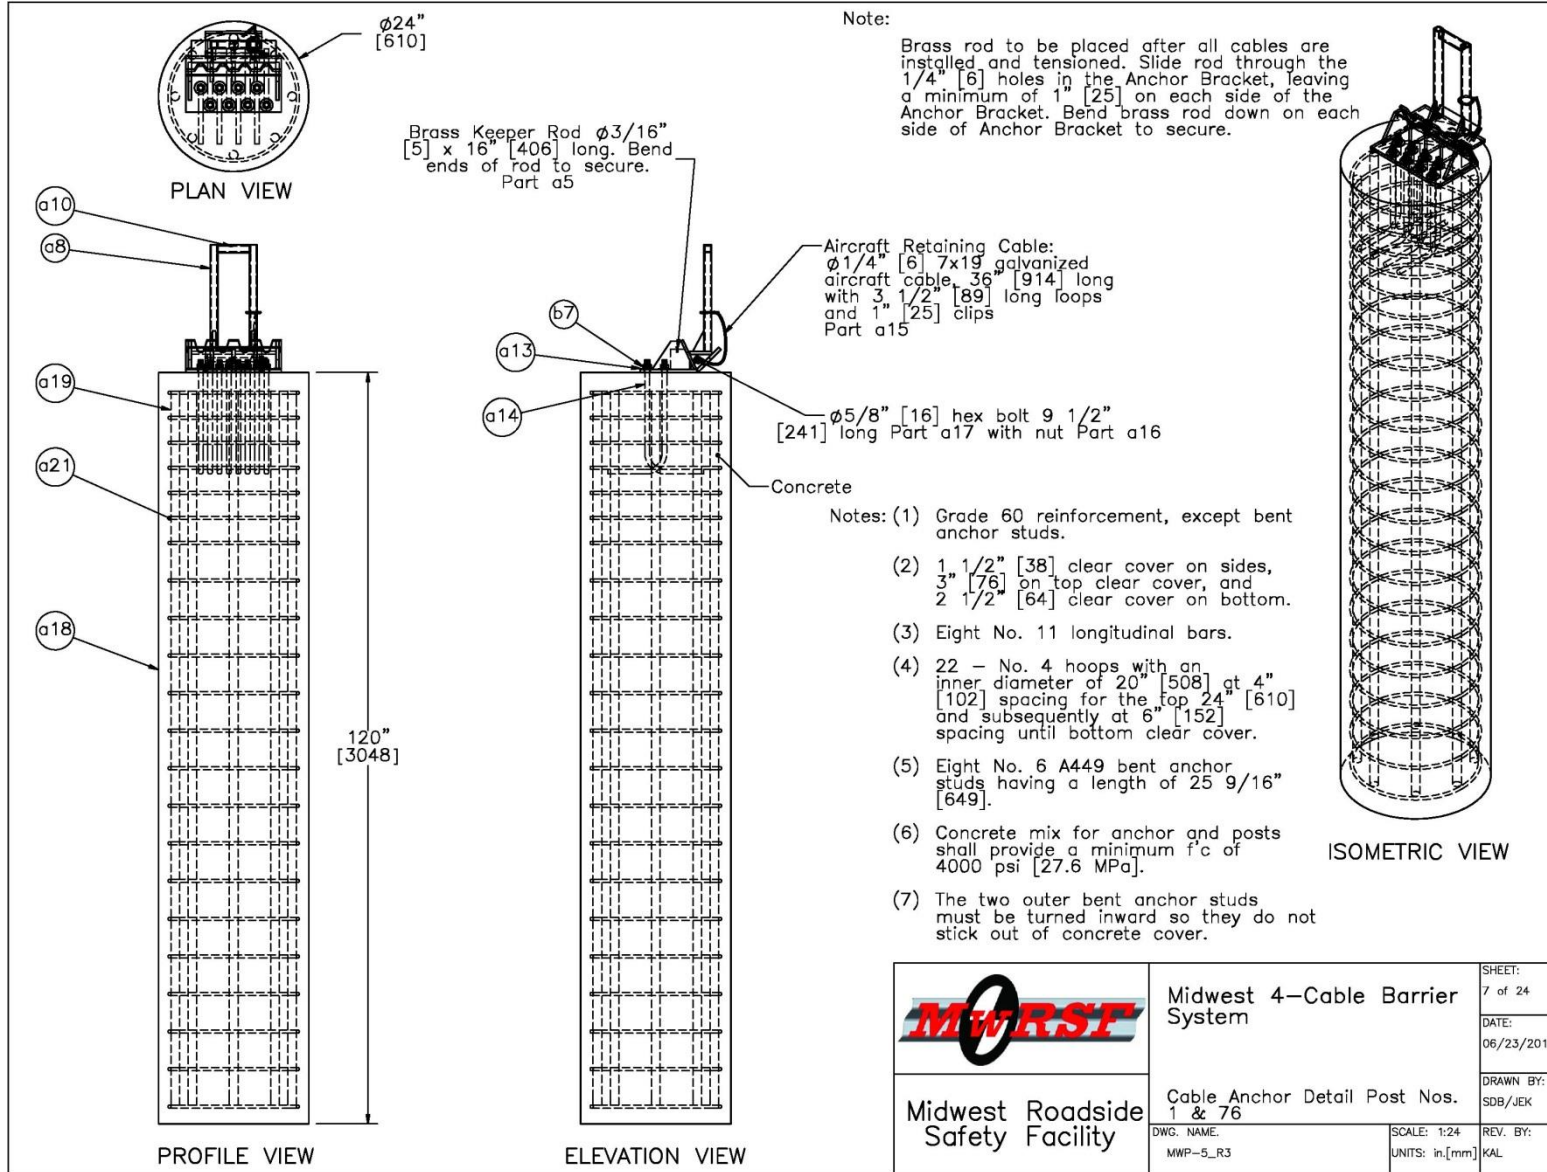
Cable Anchor Detail, Post Nos. 1 and 76, Test No. MWP-6
